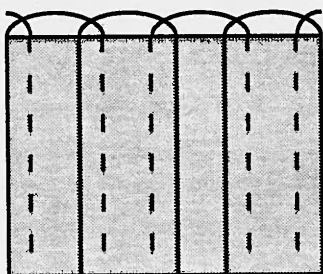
Portion of a cutoff wall comprised of interconnected, 180° columns
